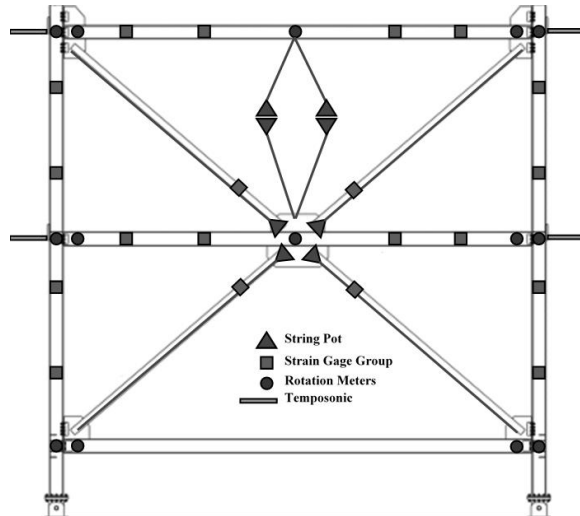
Simplified instrumentation plan. Modified from original drawing by Cameron Bradley (2016). A detailed instrumentation plan is provided in Bradley (2016).
